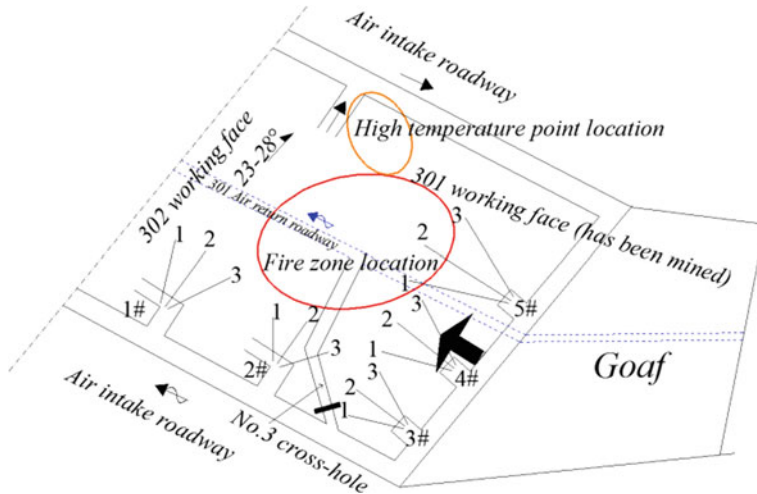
Fire zones analysis and drilling layout in 302 working face
